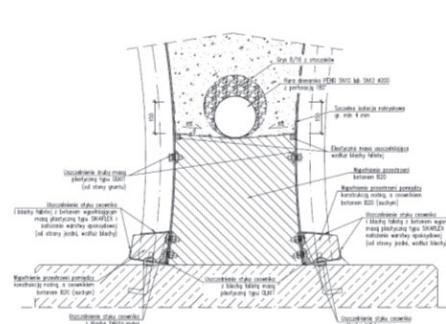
Previous solution of intermediate footing drainage. Animal overpass PZ-6 over express road S-8 in Poland
